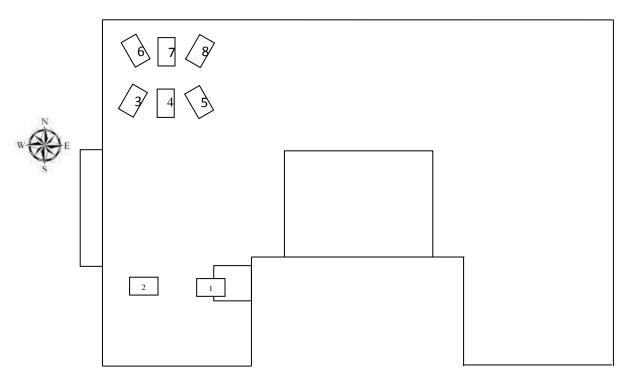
Schematic Layout of Experimental Modules Constructed on Roof Top of AED Department
